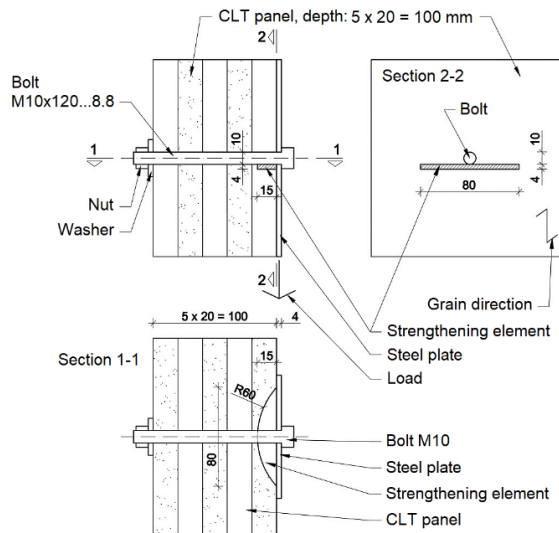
Arrangement of the bolt and steel reinforcing element in the steel-CLT shear connector [13]
